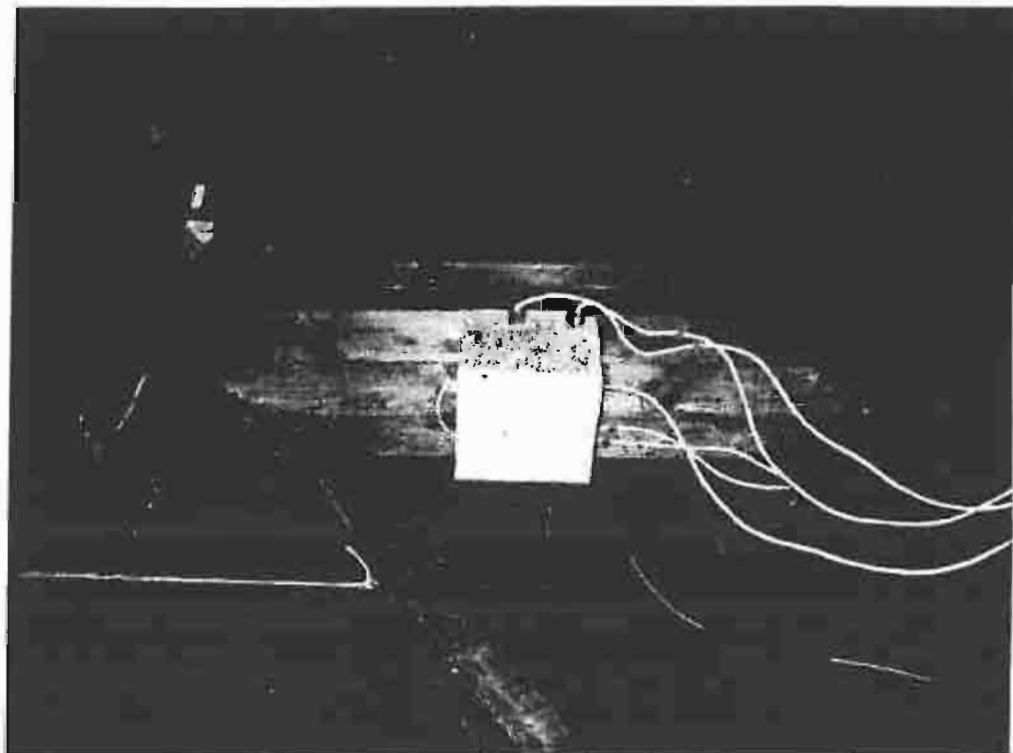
Water Stains on Roof Timber Framing. (2014-05-23)
